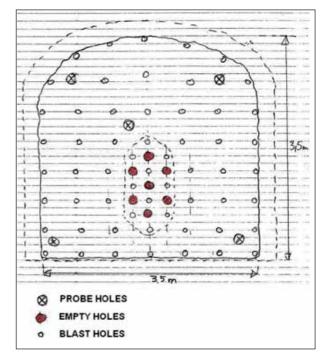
Final drill plan for underwater piercing blast round showing probe holes, empty holes and blast holes. (Illustration: Dyno Nobel)
